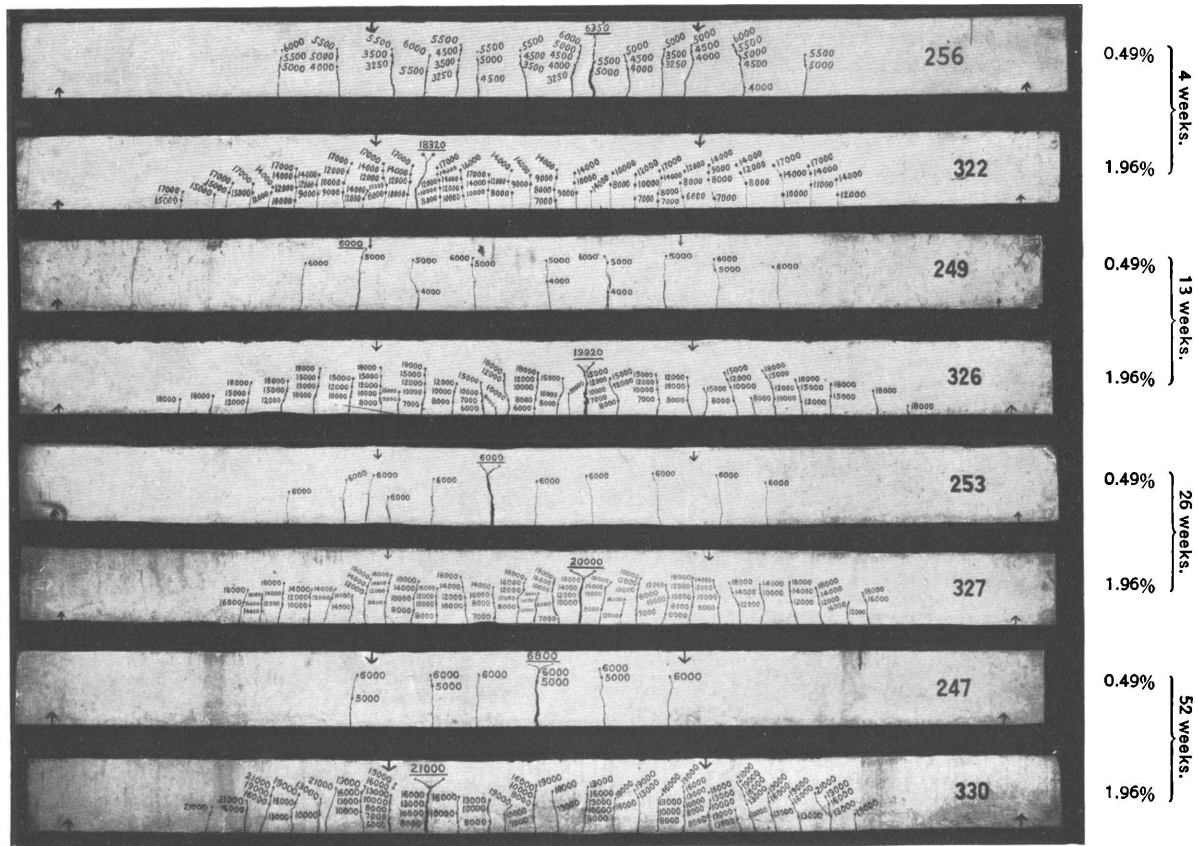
Limestone Concrete, Showing Beams with 0.49 and 1.96 Percentages Reinforcement
